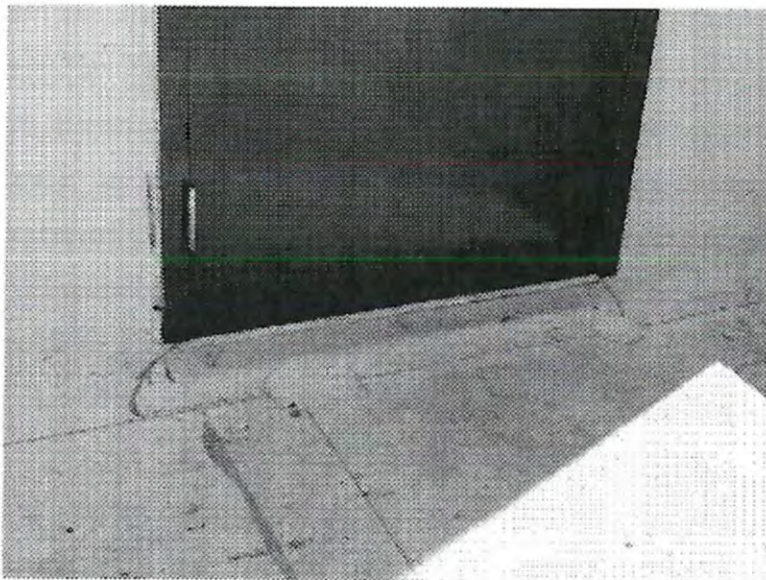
Roof access door threshold lower than industry standard 8-inch minimum.
